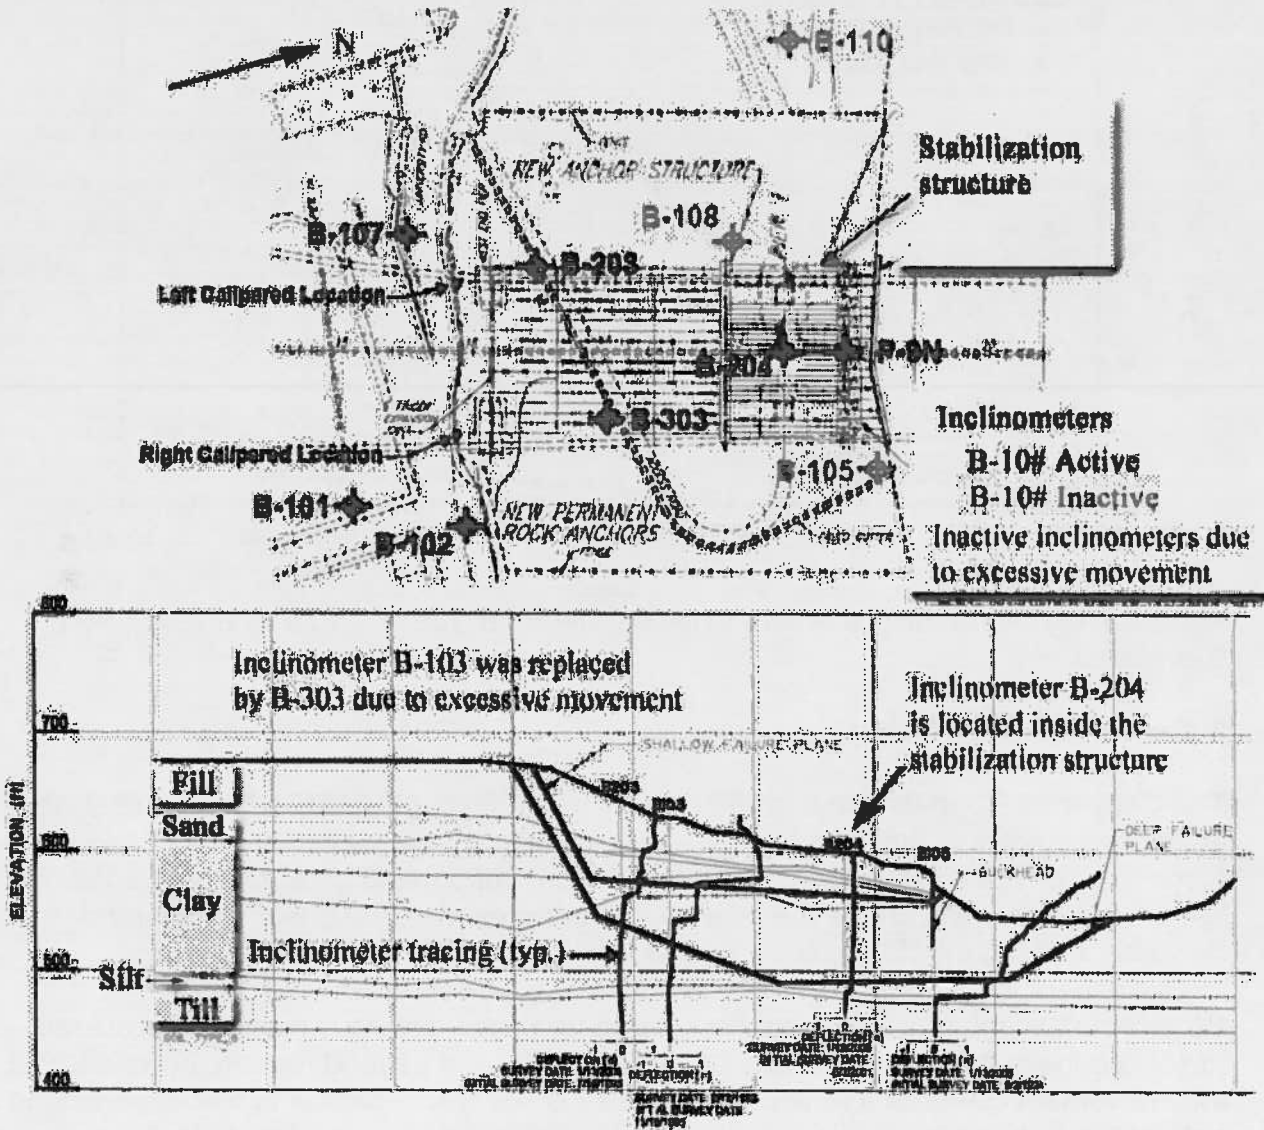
Plan view and cross section of slope beneath I-90, near downtown Cleveland
